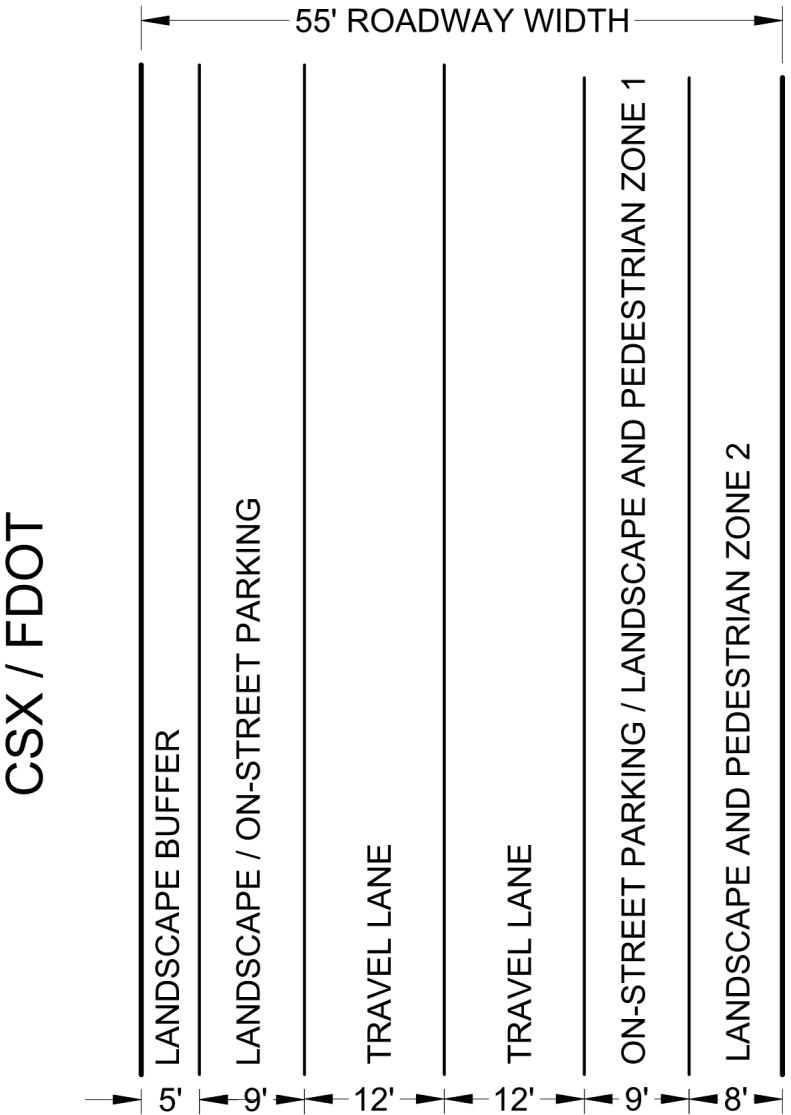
b SW 30th Avenue Road Profile Not Abutting Interstate-95
